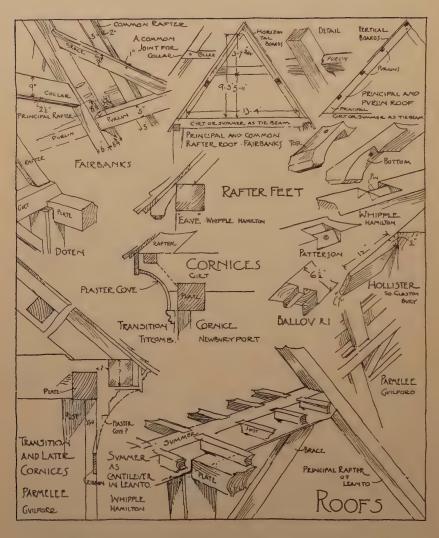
FRAMING DETAILS. ROOFS AND CORNICES
